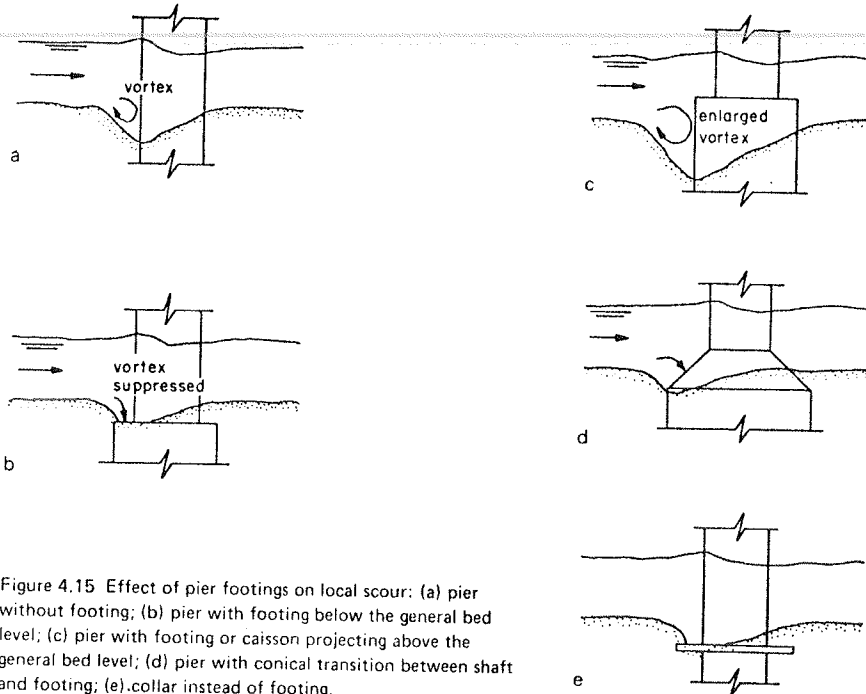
Effect of pier footings on local scour: (a) pier without footing; (b) pier with footing below the general bed level; (c) pier with footing or caisson projecting above the general bed level; (d) pier with conical transition between shaft and footing; (e) collar instead of footing.
